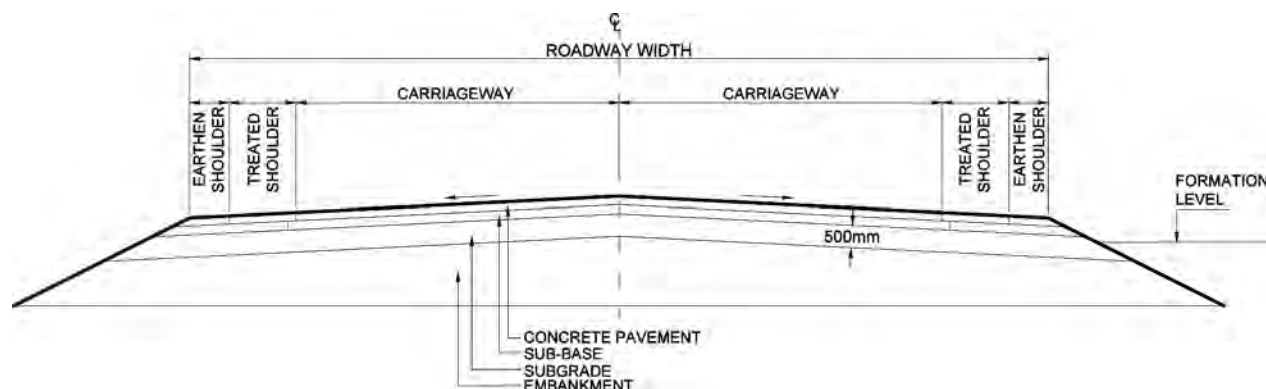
Terms Used in the Specifications to Describe Road Cross-Section Elements with a Concrete Pavement
